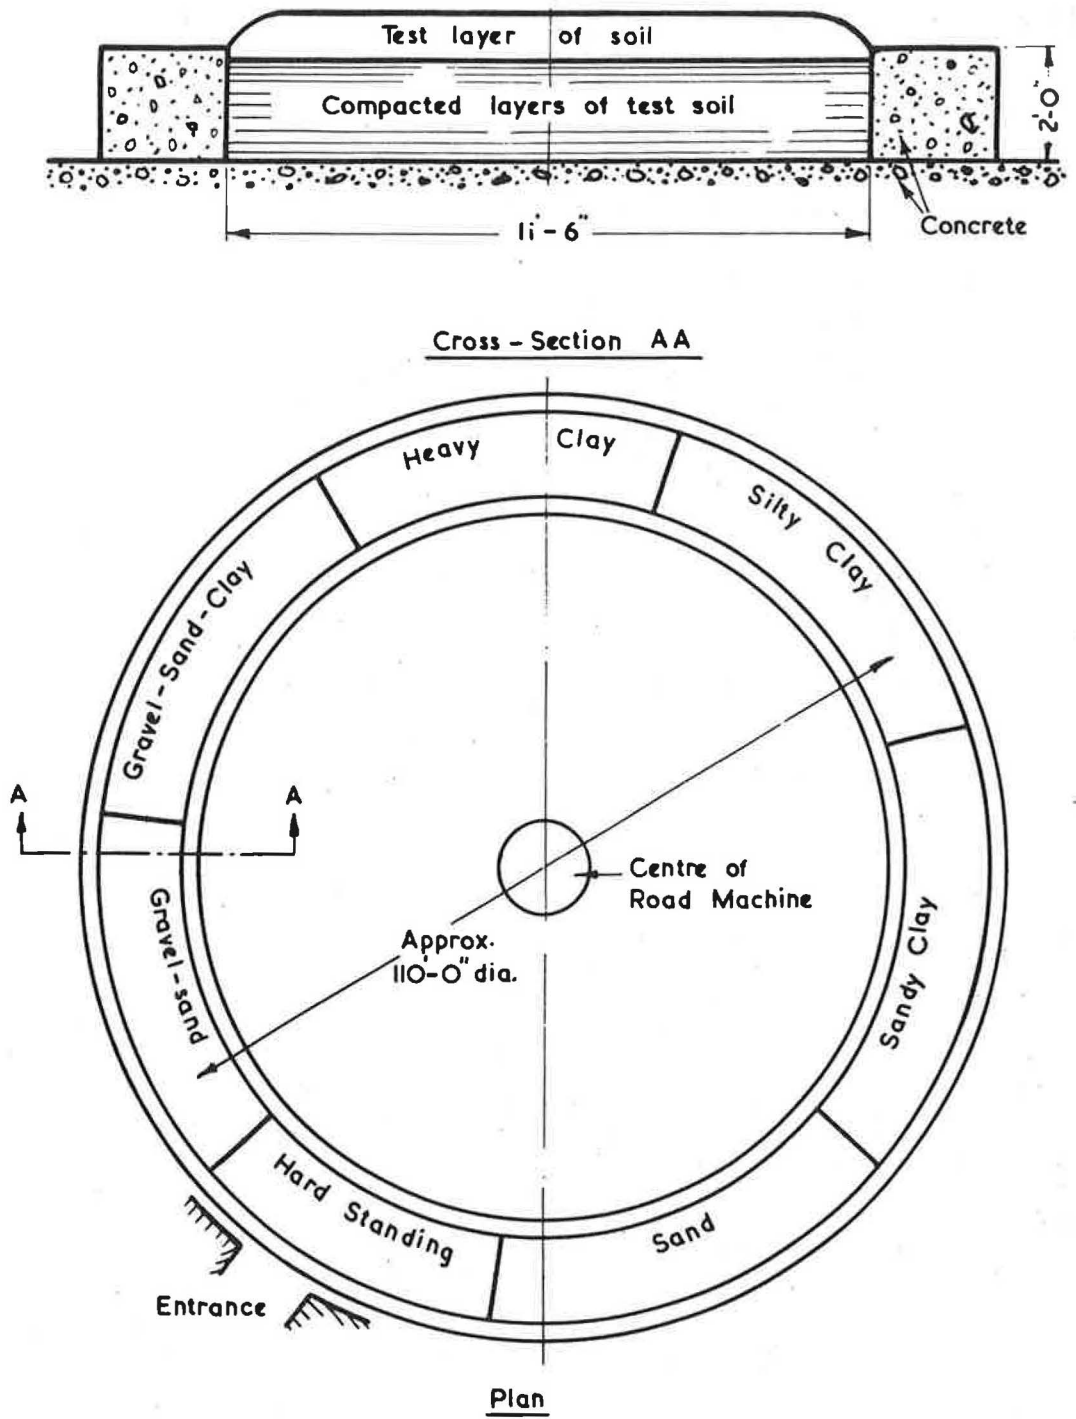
Plan and cross-section of earlier circular track used for full-scale compaction tests.
